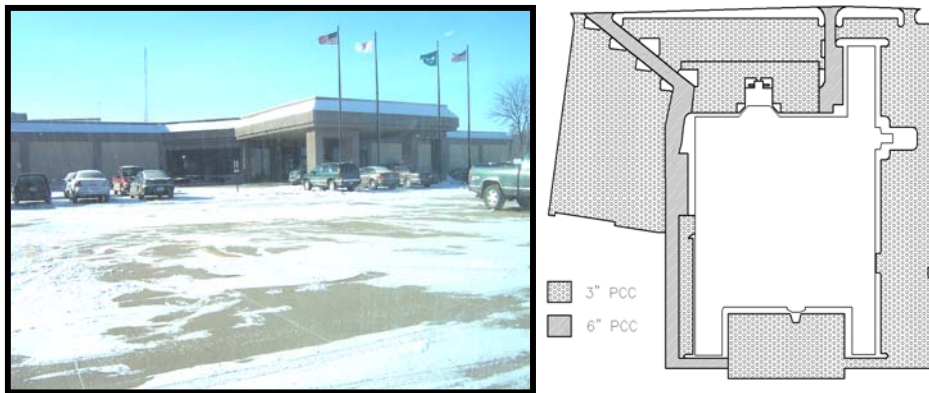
View and parking lot layout of Decatur Holiday Inn parking lot.
